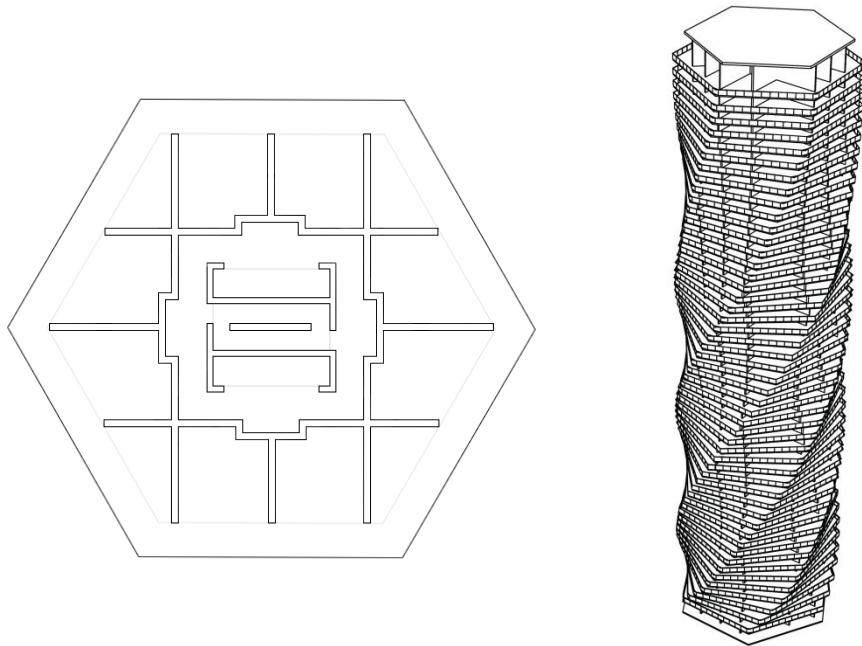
Plan and model of the tower with hexagonal floors and a decreasing angle of rotation.
